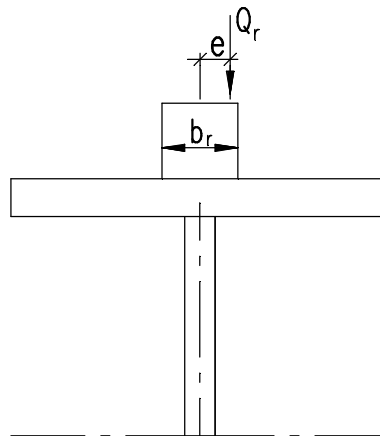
Load arrangements to obtain the relevant vertical actions to the runway beams
